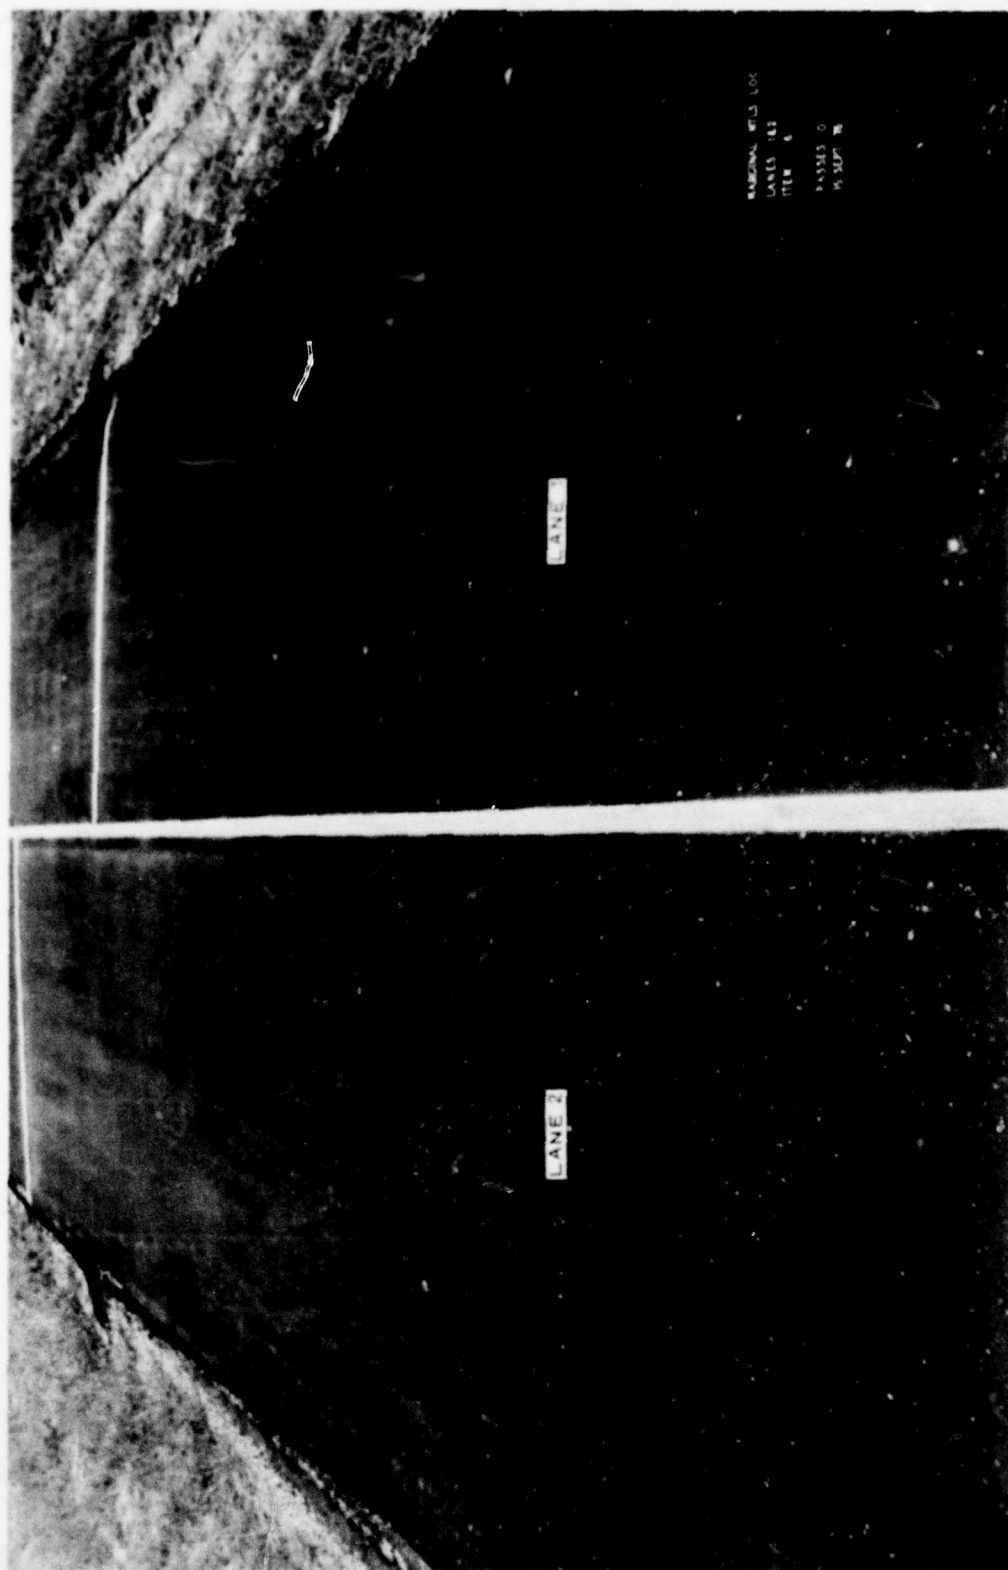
General view of item 6 (flexible pavement) prior to traffic
